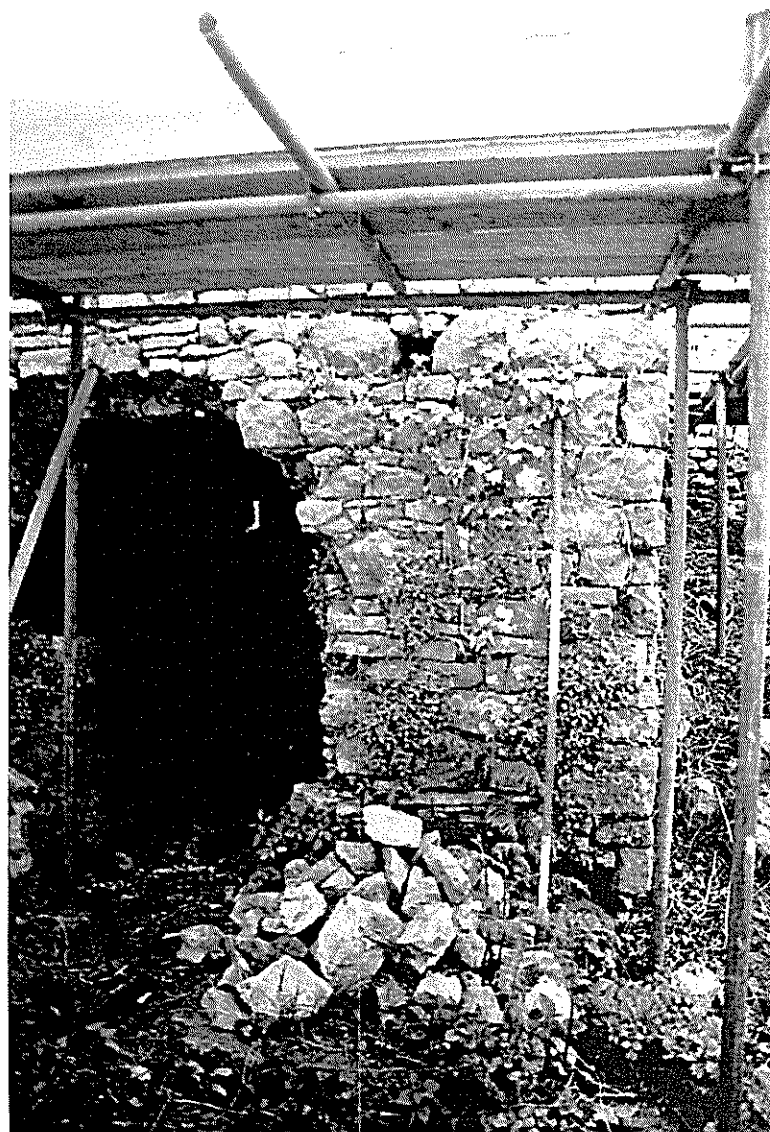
Lydstep Palace, Room 1 interior: North wall - west end
